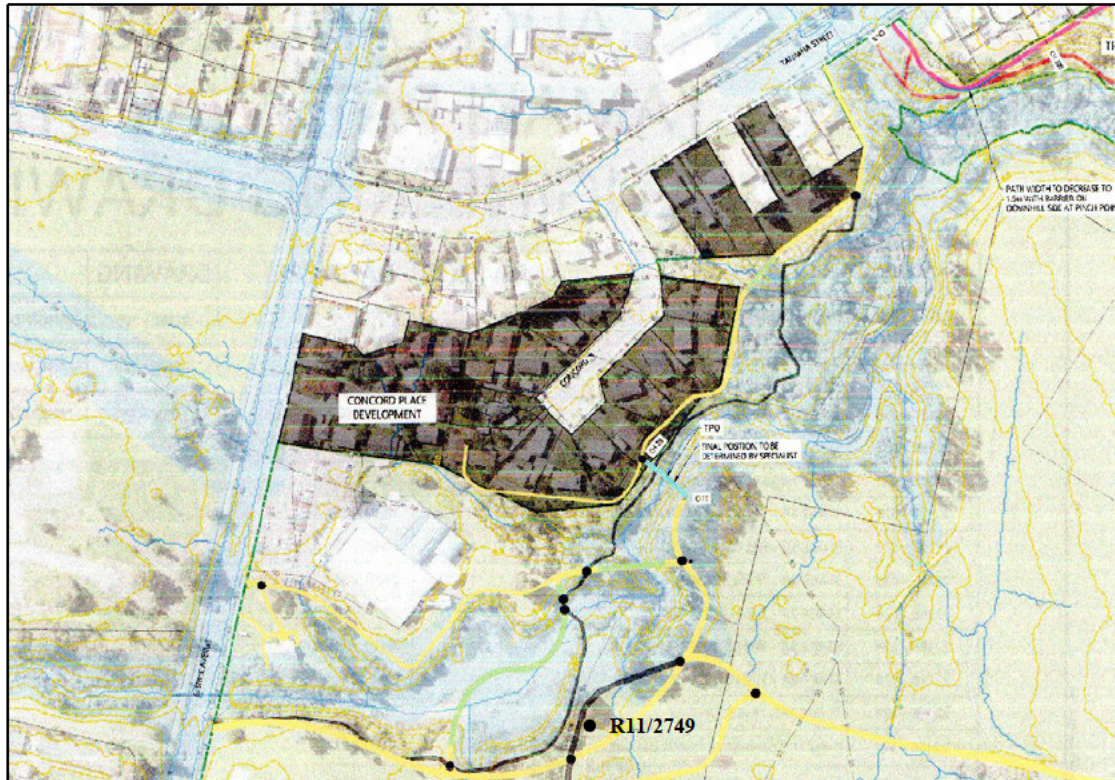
Southern section with new bridge crossing the upper Omaru Creek (Renature 2024).
